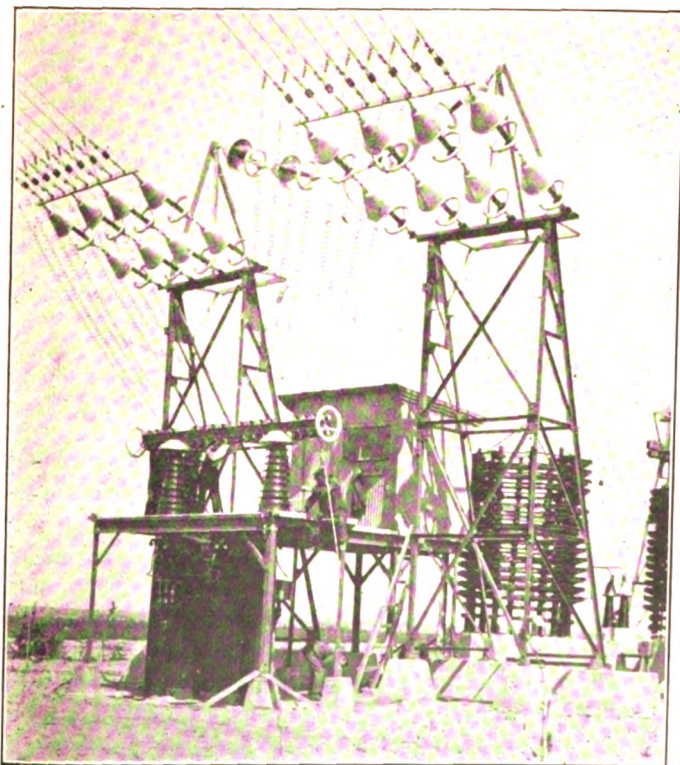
Antenna Dead End Structure, Showing Sleet-Melting Platform, Switch Rack, and Sleet-Melting Control House.
